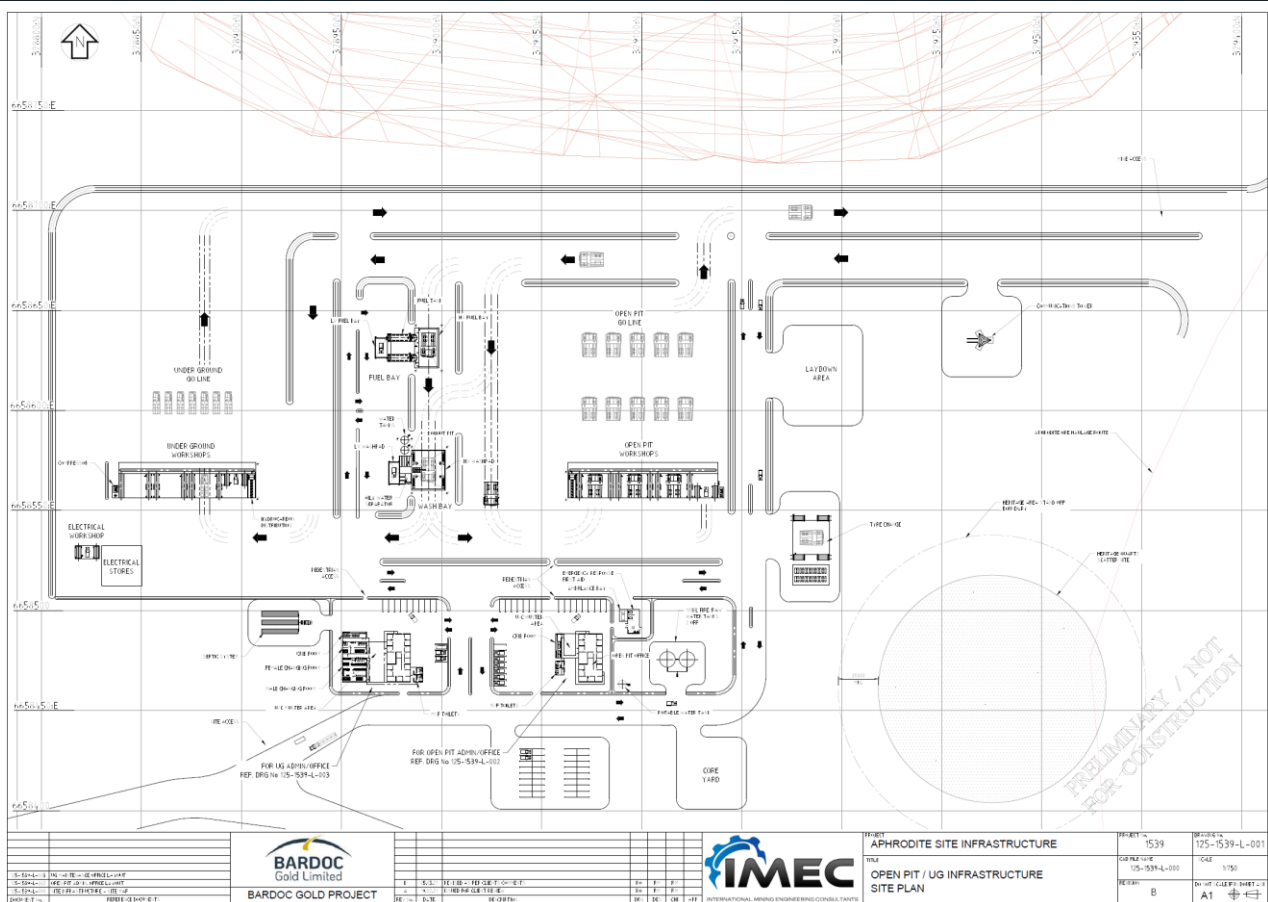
Aphrodite Open Pit and Underground Workshop Arrangement
